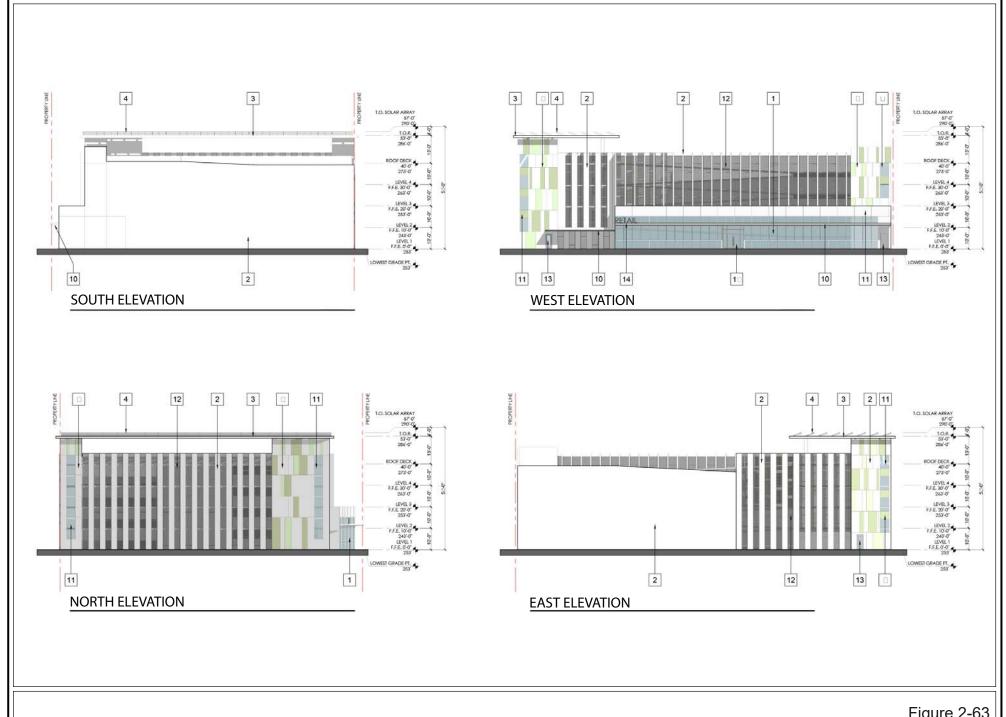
Exterior Elevations - Parking Structure - Site 2
